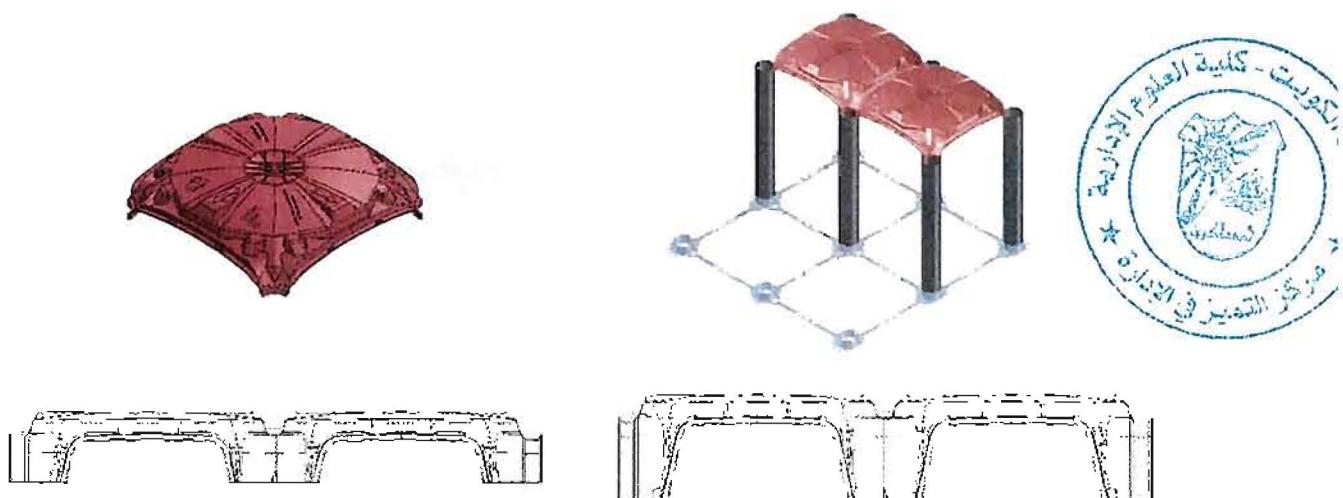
ABS plastic disposable formwork for reinforced concrete slab construction.
